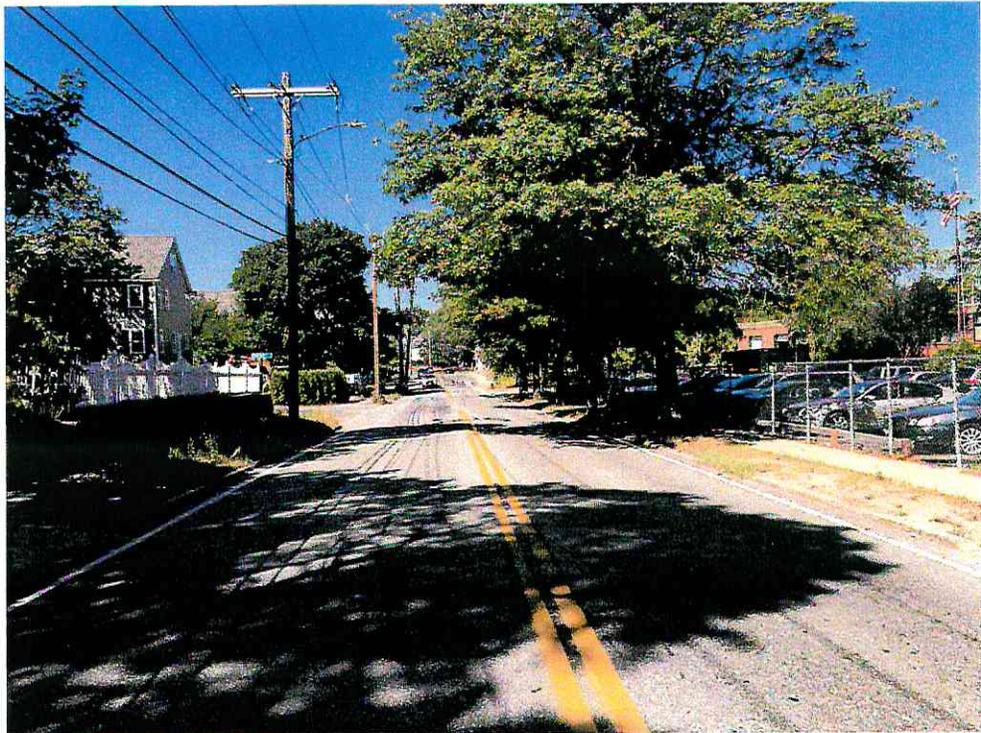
Location b – Cross St. looking west. 65' east of Wendell St.
